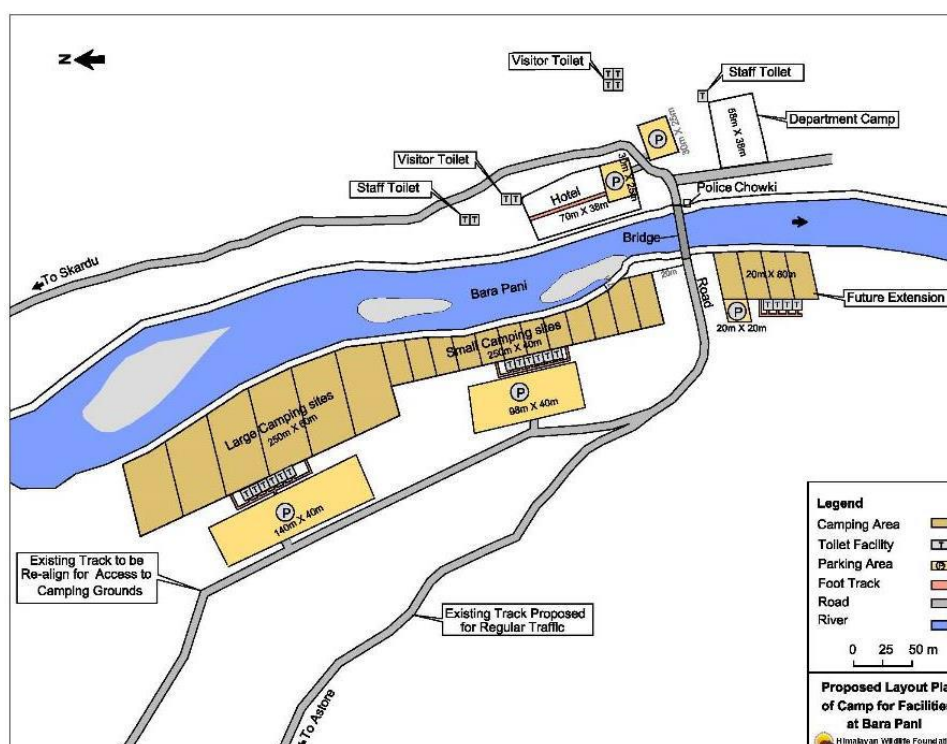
Draft Layout of the Camping Facilities at Bara Pani
